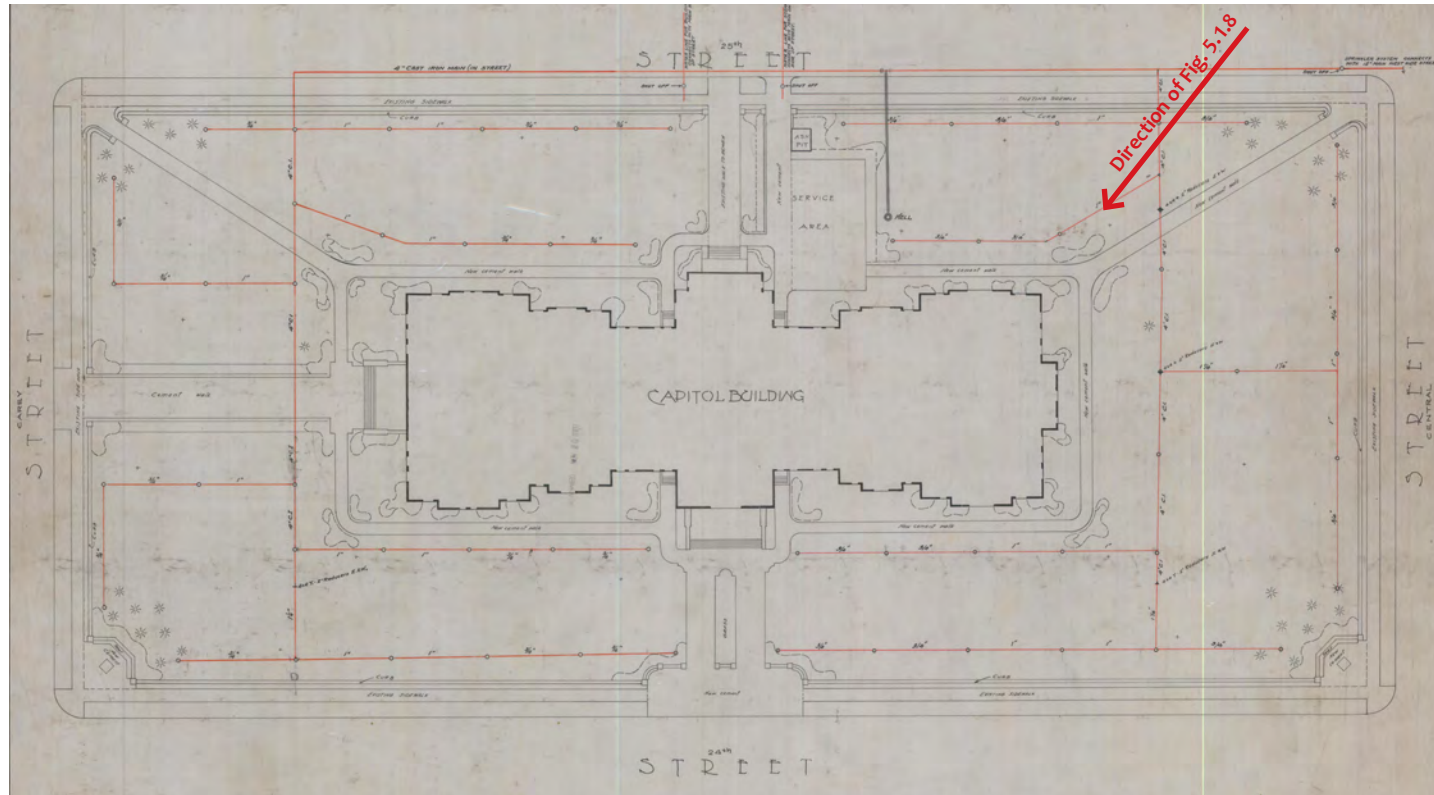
Existing Capitol Grounds Site Plan, ca. 1934.
